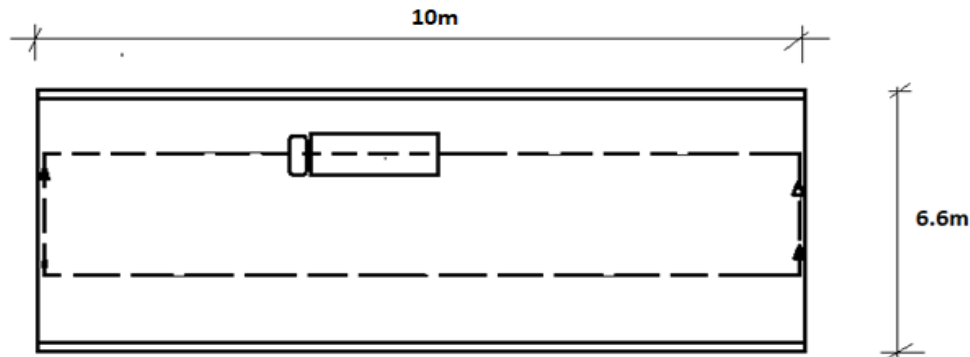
Plan of 10 metres Single span composite steel box-girder bridge deck
